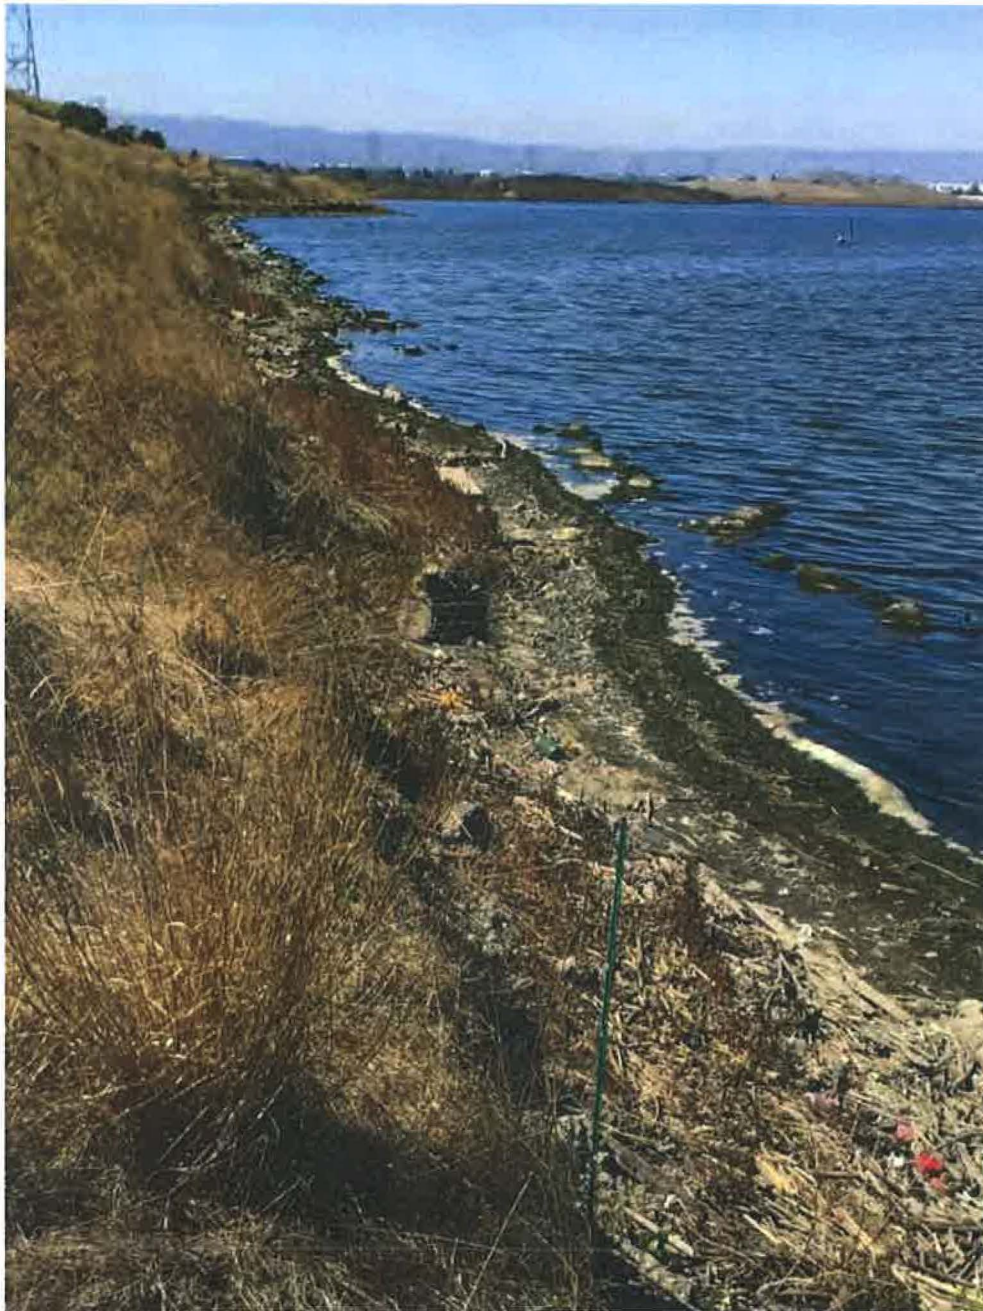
Pond A8 Shoreline at Southeast Corner Looking West Where Habitat Transition Zone Would be Installed (Salt Pond Jurisdiction area)
